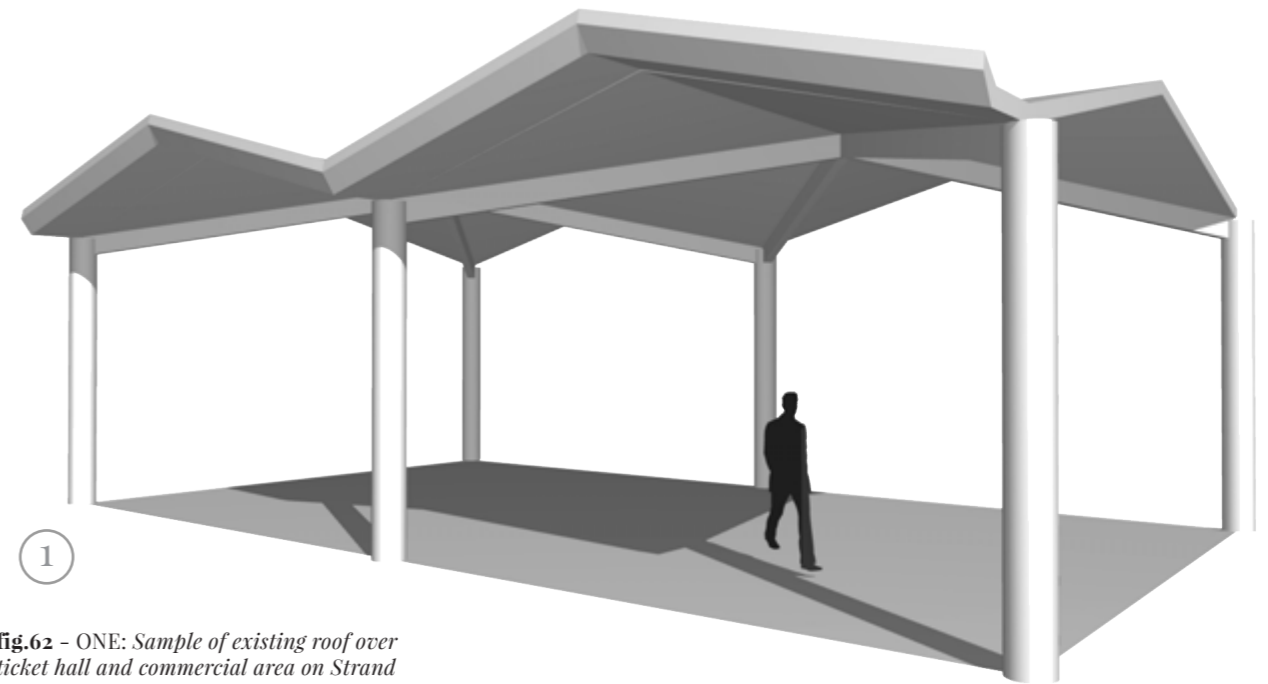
ONE: Sample of existing roof over ticket hall and commercial area on Strand Street. (by author)
